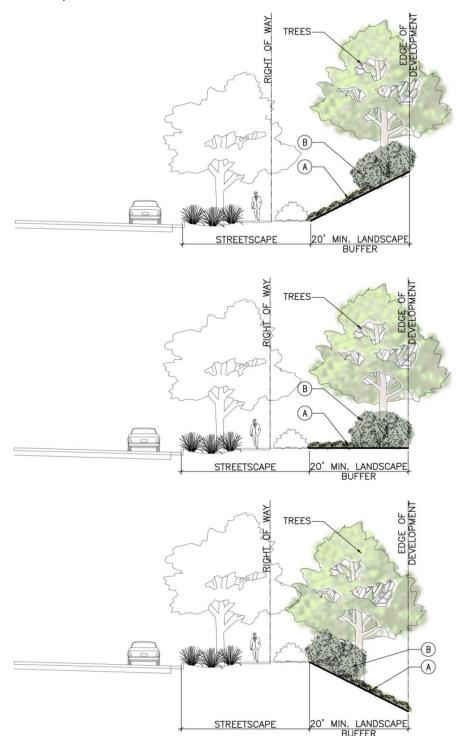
Slope Planting Guideline (From Top: Up-slope, Flat-slope, Down-slope)
